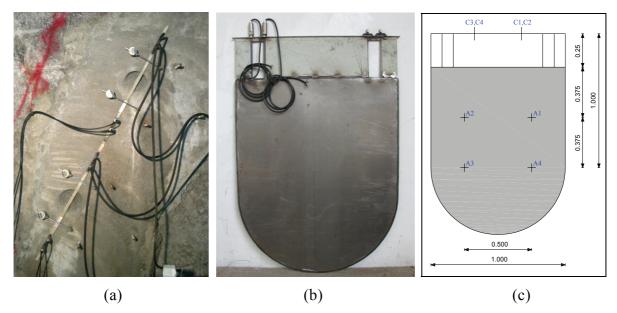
(a) flat jacks installed in two contiguous slots, ready for testing, showing the displacement gauges installed at the surface; (b) flat jack; (c) scheme with the location of the displacement transducers
